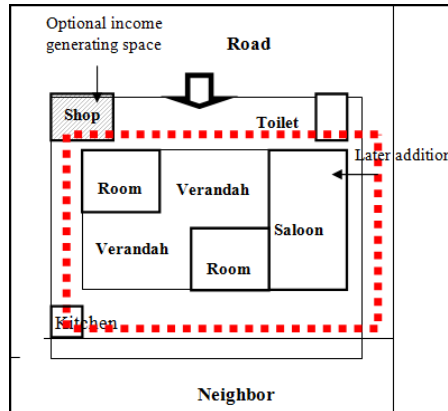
House Type A with full adoption of the Ministry of Engineering Affairs’ plan
